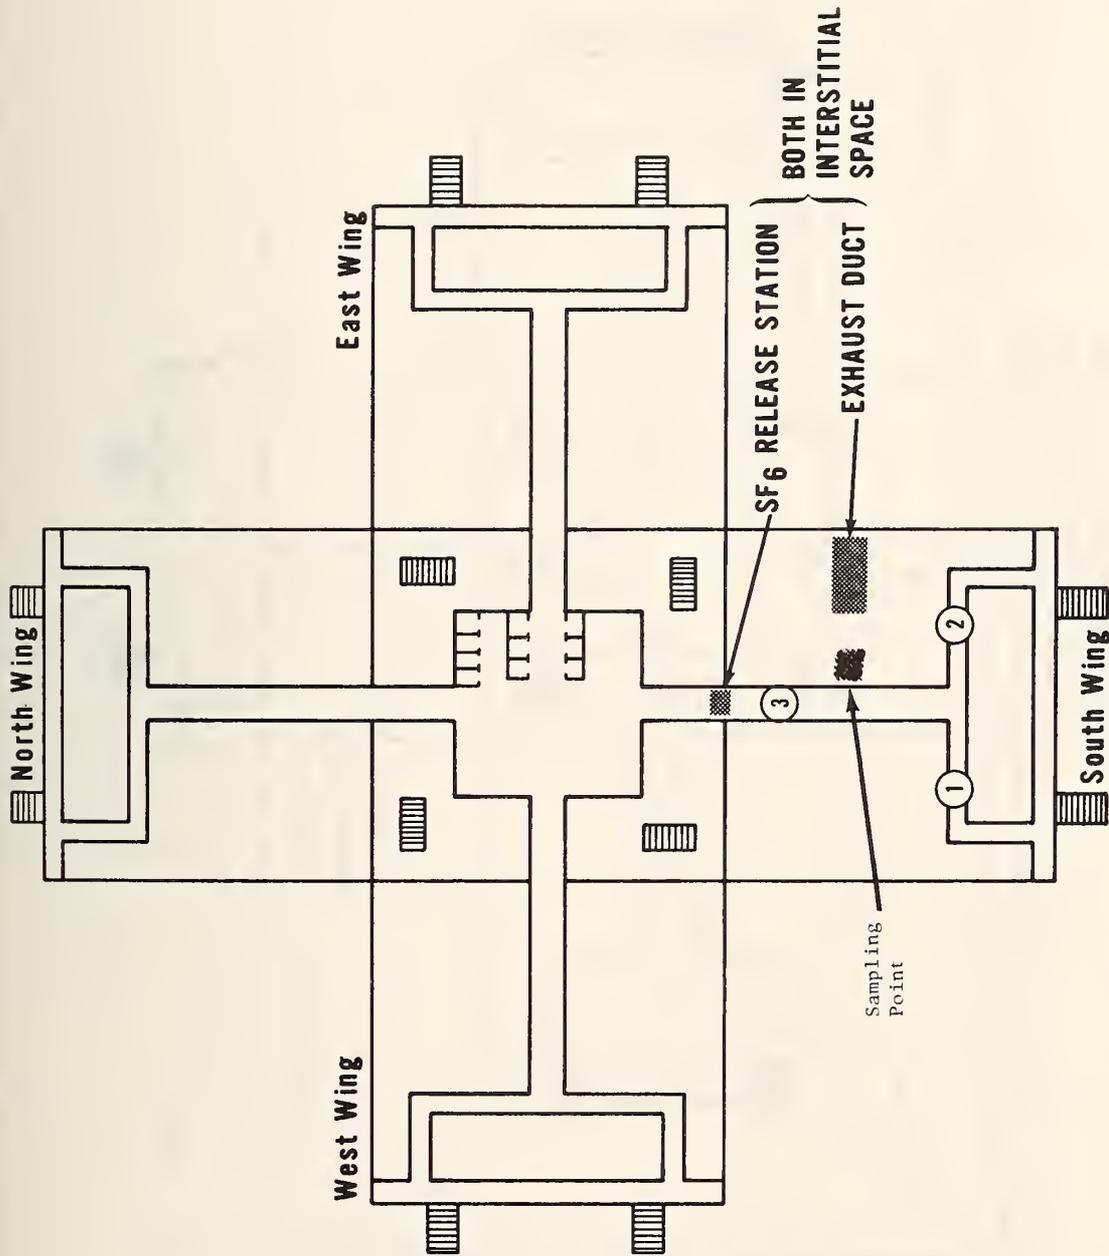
Sampling Locations for Smoke Test (Samples Collected from Third Floor and also Interstitial Space)
